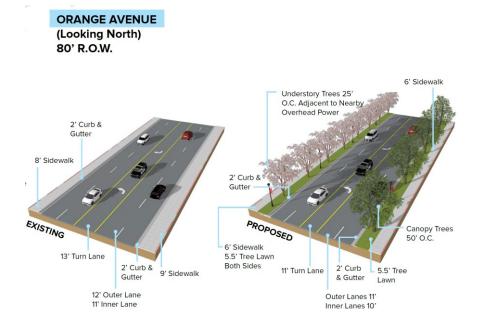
Orange Ave Cross Section (source: Downtown Master Plan)
